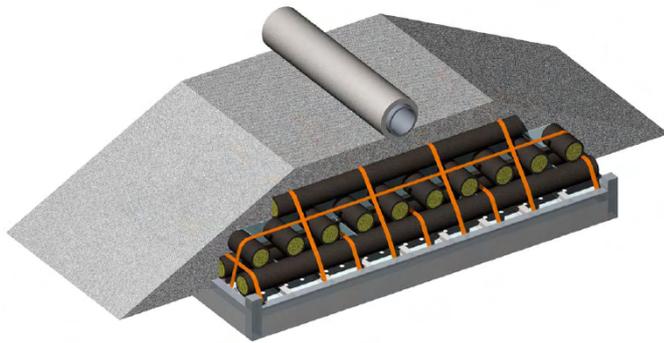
Support structure constructed of foldable mud-mats, foam-filled HDPE pipes and gravel
